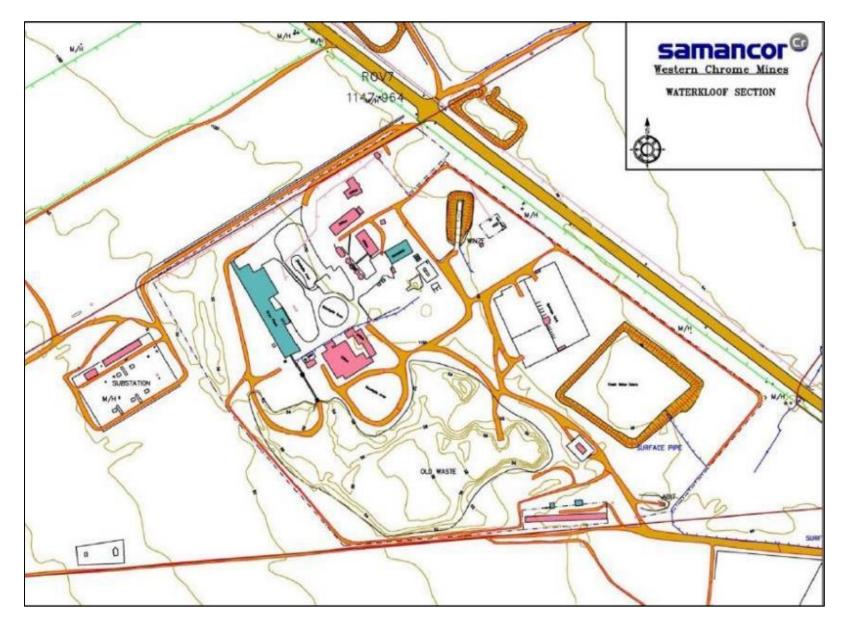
Surface infrastructure layout at the current Waterkloof Section
